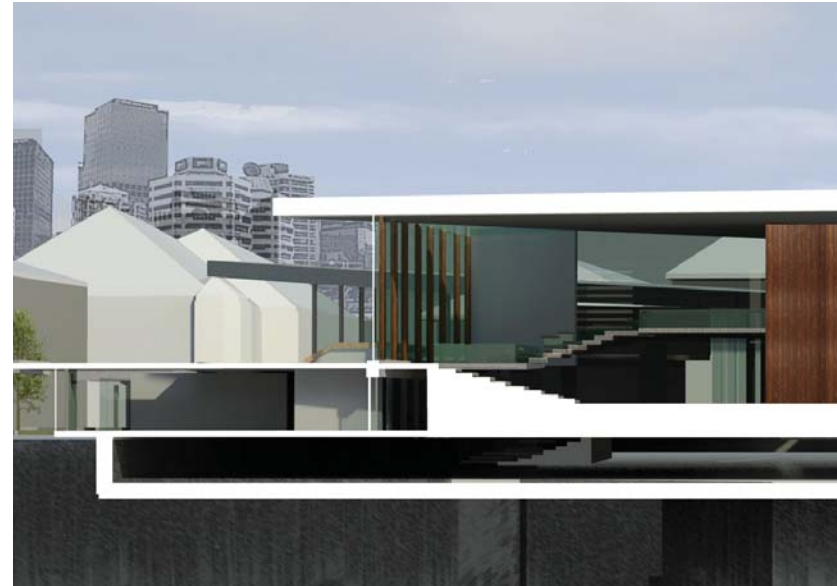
Section through the central staircase providing access up onto the roof terrace as well as to the upper foyer. The staircase begins in the underground car park and leads up to the atrium space
